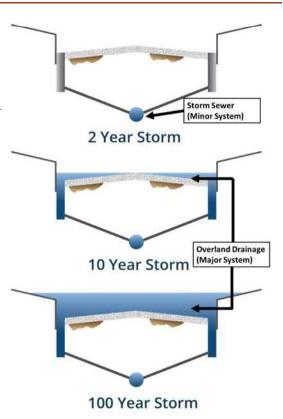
Sewer Drainage Design and Overland Drainage Design.
